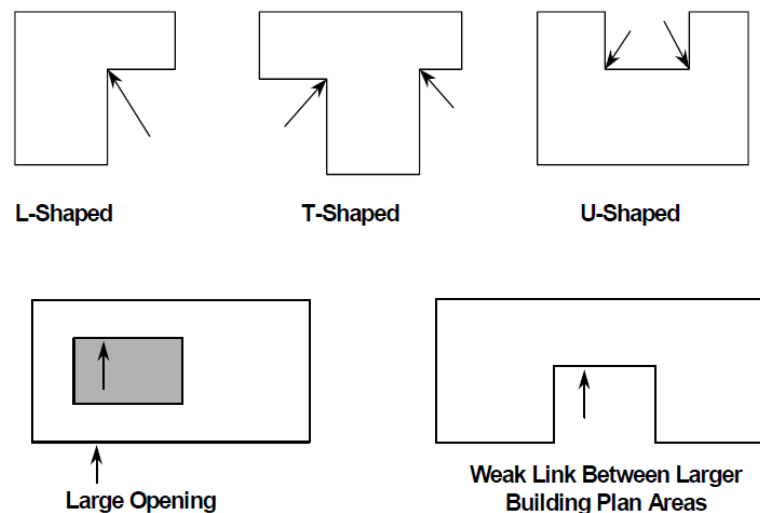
Plan views of various building configurations showing plan irregularities; arrows indicate possible areas of damage.
